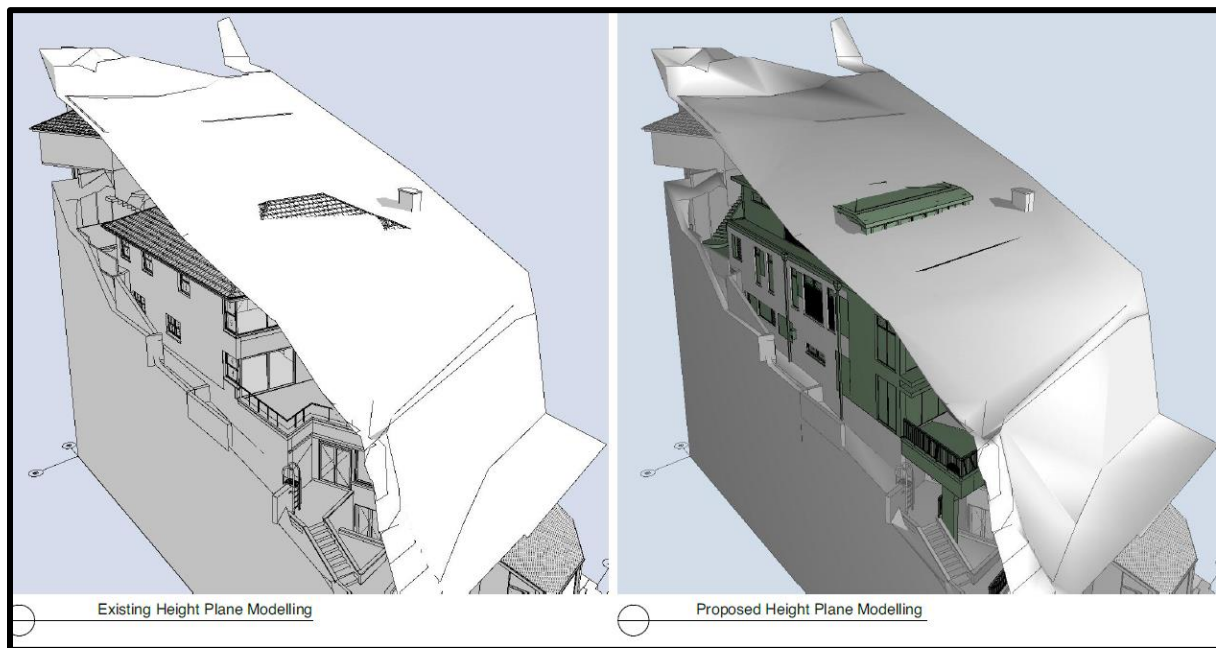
Height Plane Modelling (Source: Antonio Caminiti)
